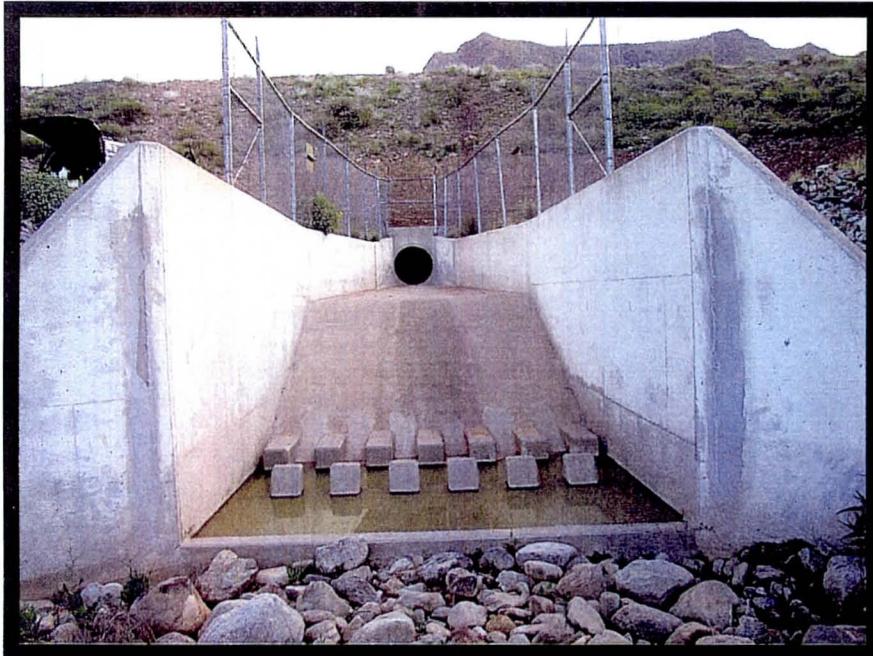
Principal Outlet Structure and Energy Dissipator.
